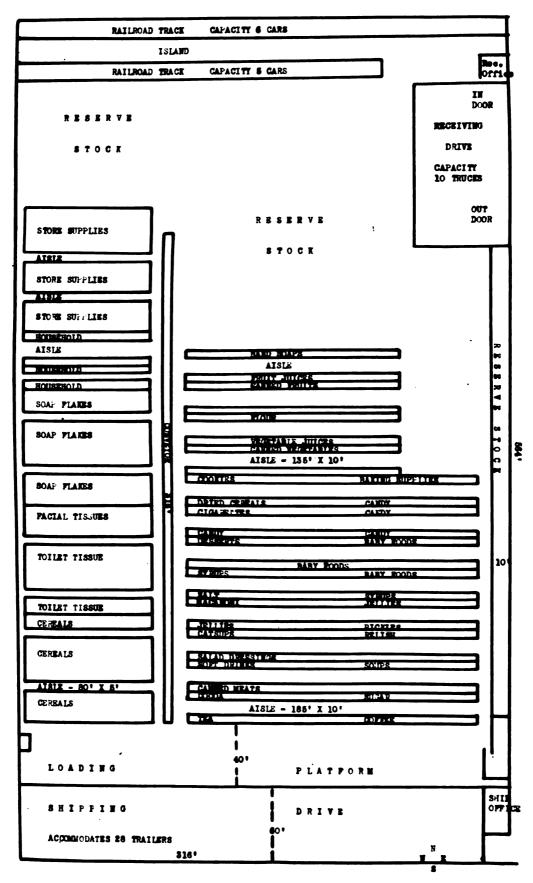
Warehouse layout of the Jewel Tea Company, Incorporated.
